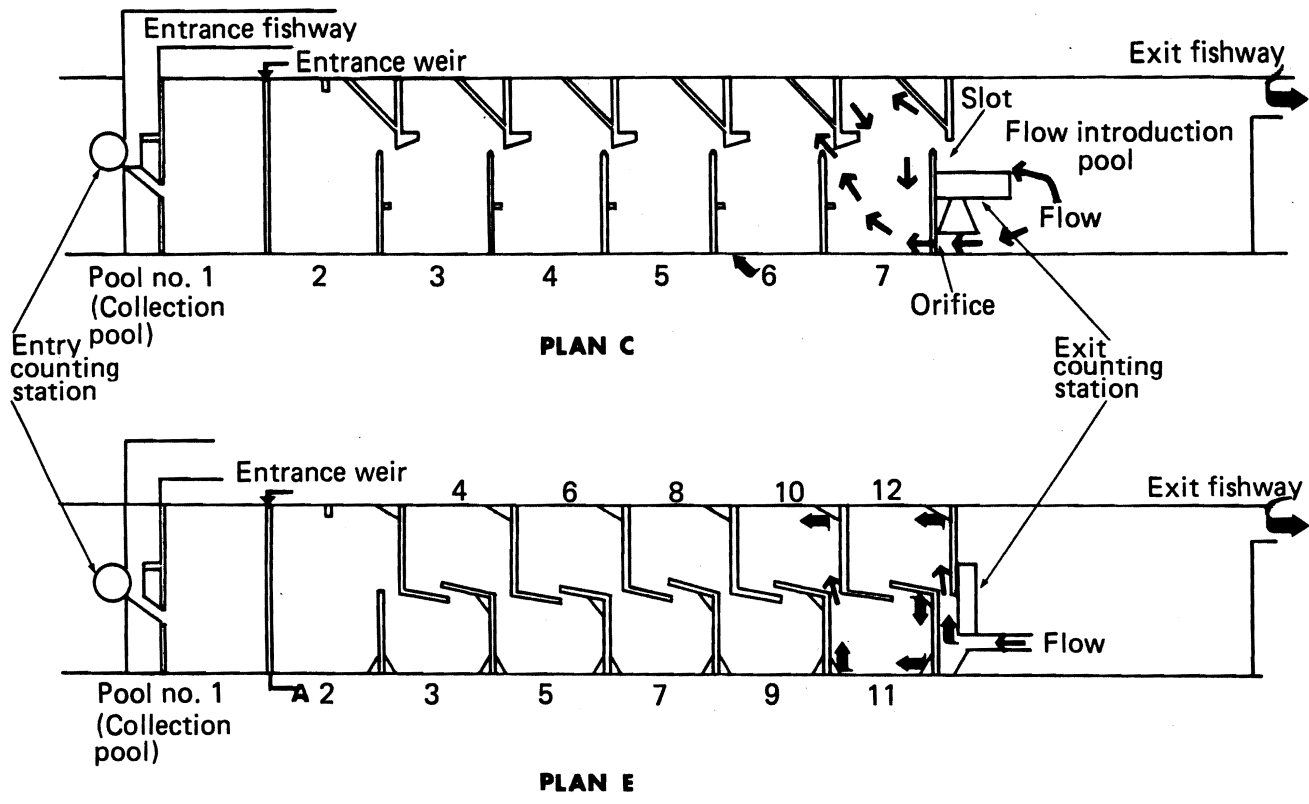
Overhead views of the Plan C and Plan E fish ladders tested in 1970.
